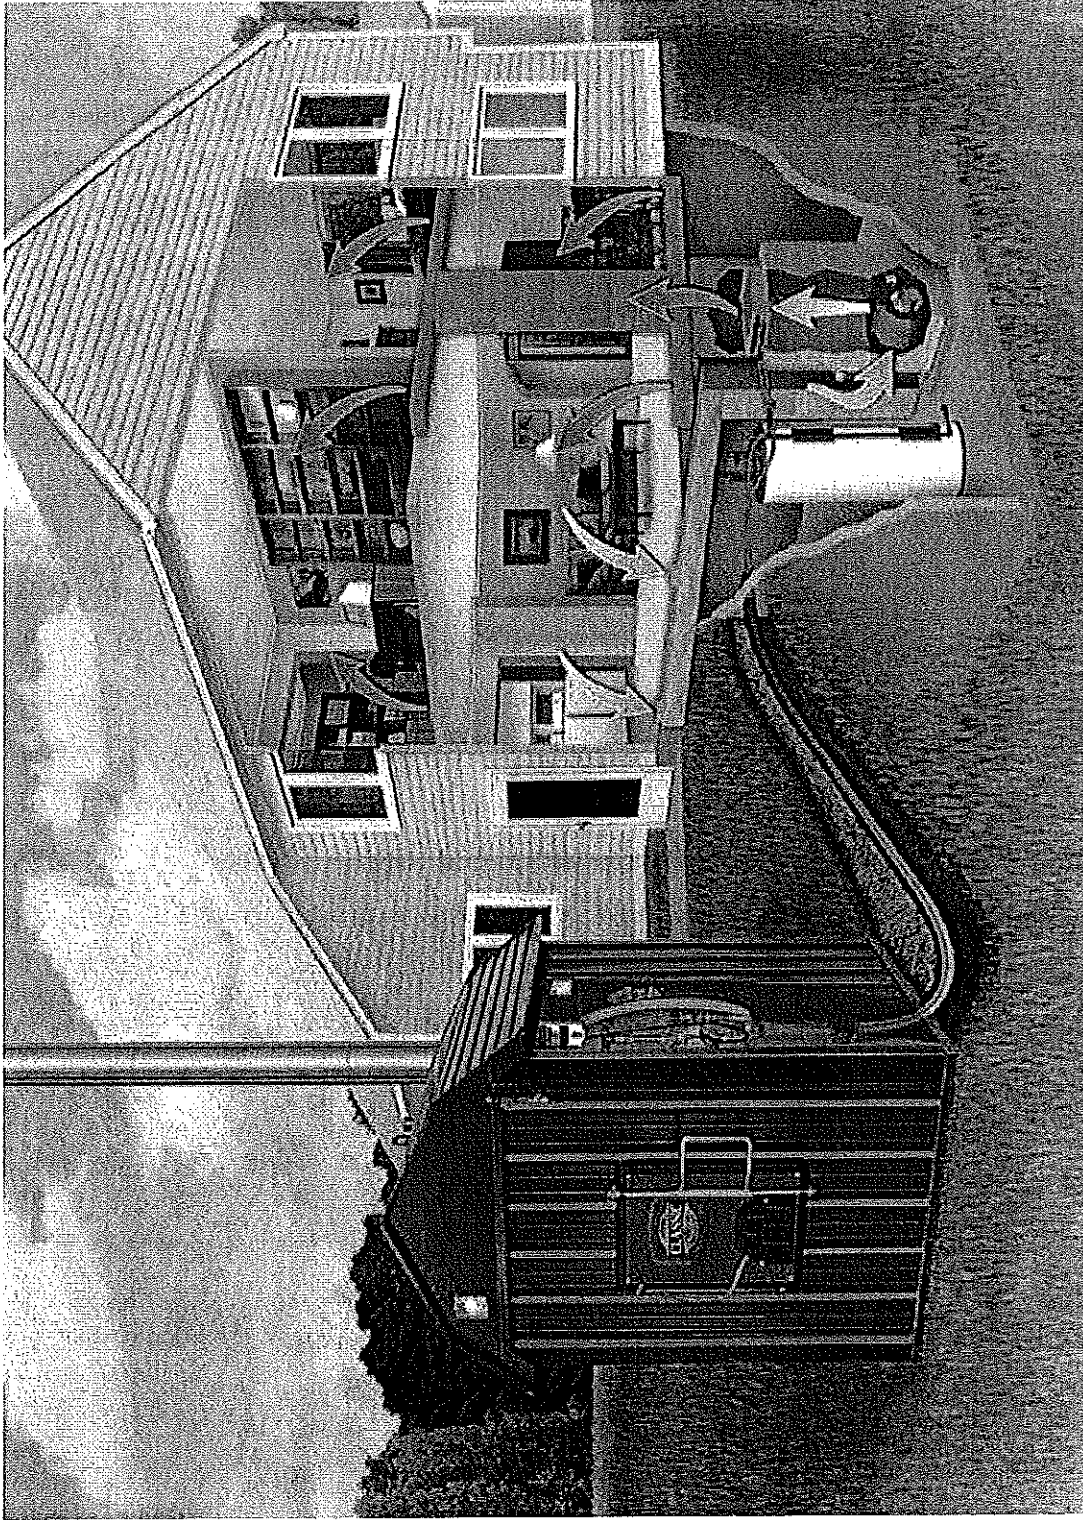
Concept Rendering Showing a Typical Installation of a Outdoor Wood Hydronic Heater Installation
